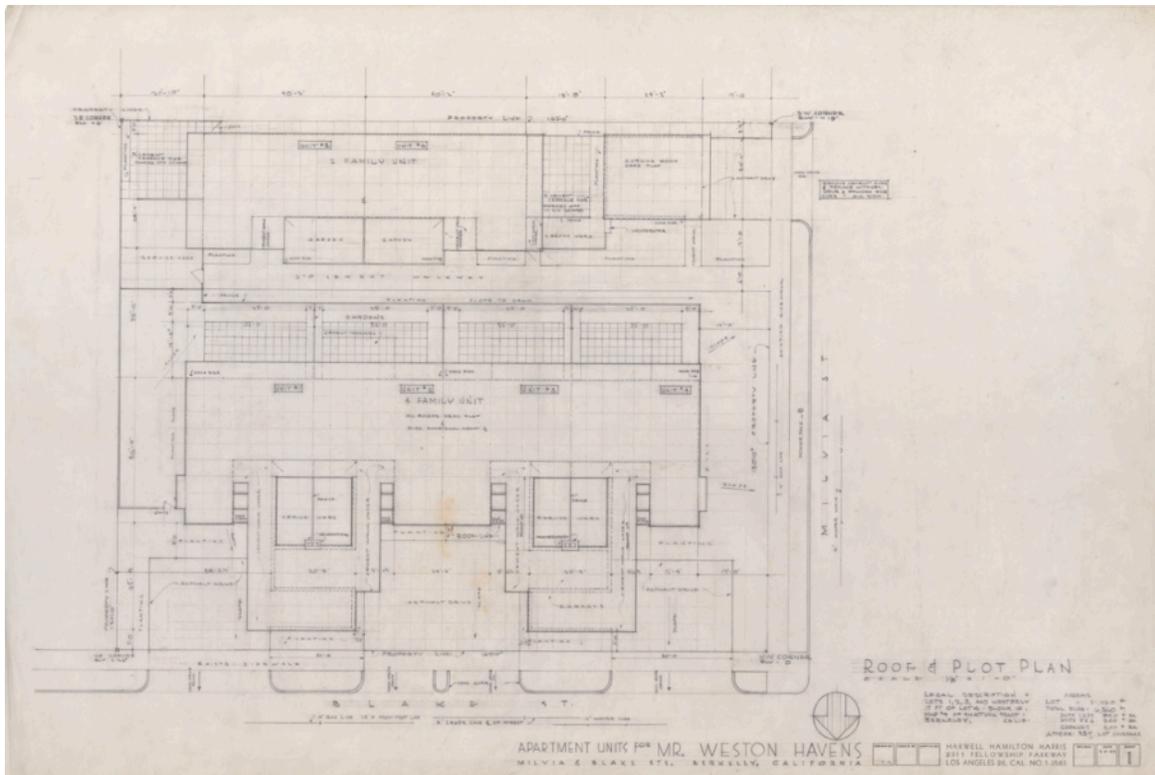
Complete site plan for the Havens Apartments. Courtesy of the Harwell Hamilton Harris Collection at the Alexander Architectural Archives, University of Texas, Austin.
